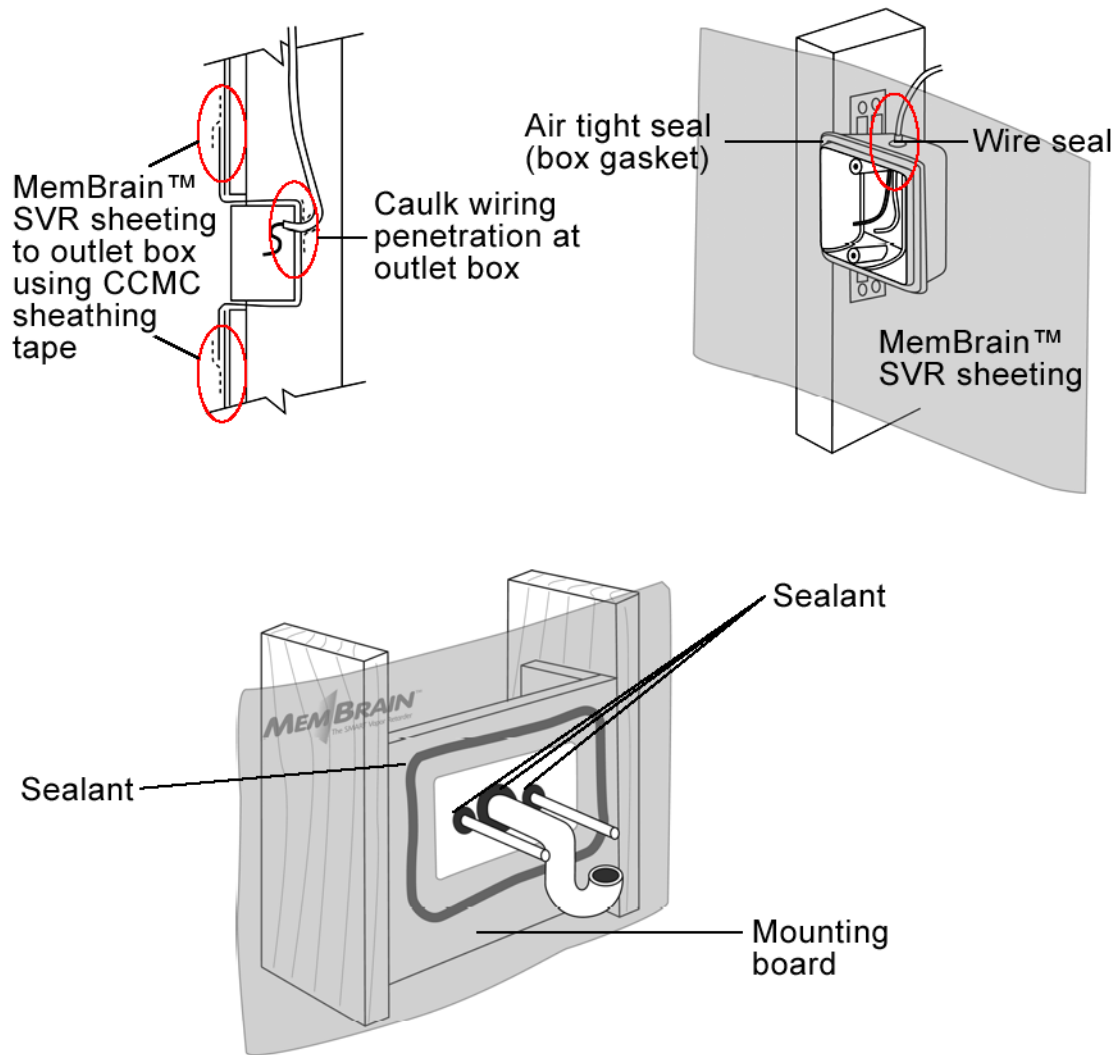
"MemBrain™" details for sealing plumbing and electrical penetrations.
